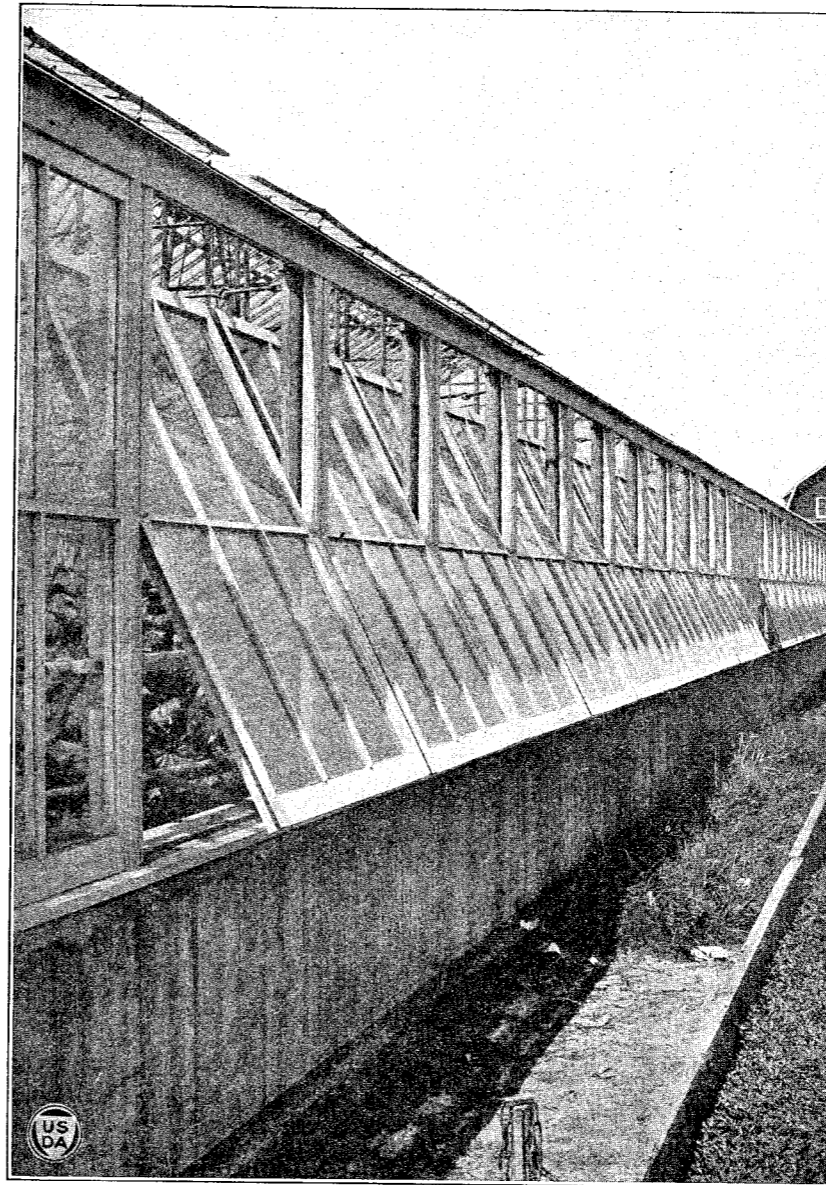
A type of construction where the portion of the wall of the greenhouse between the masonry and the eave plate is taken up with ventilators.
